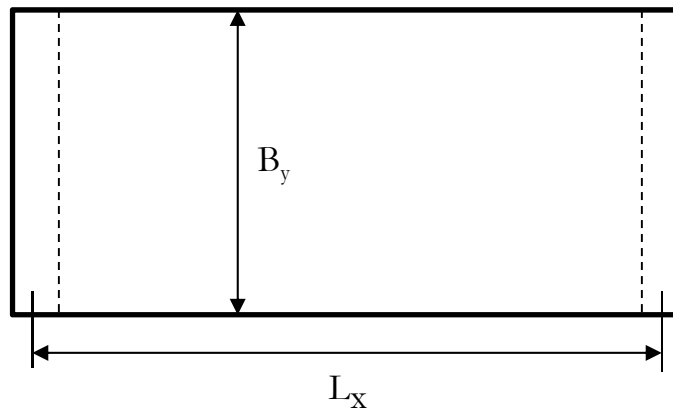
One-way spanning bridge (here, a single span integral bridge).
